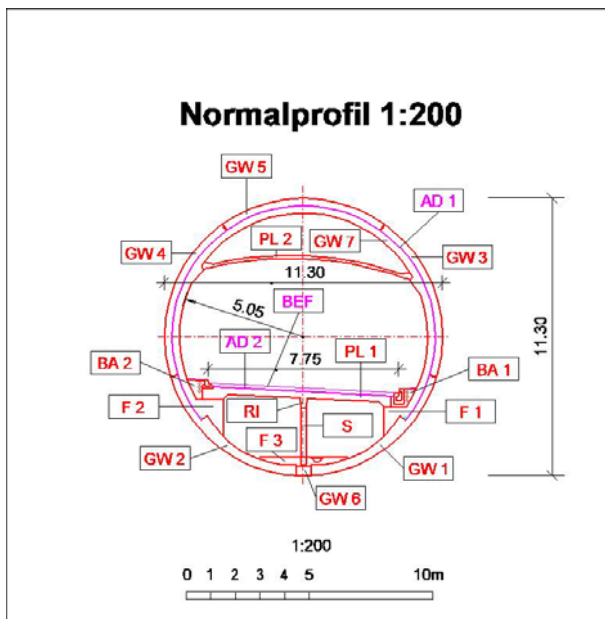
Rosenberg tunnel, cross section built with tunnel boring machine
